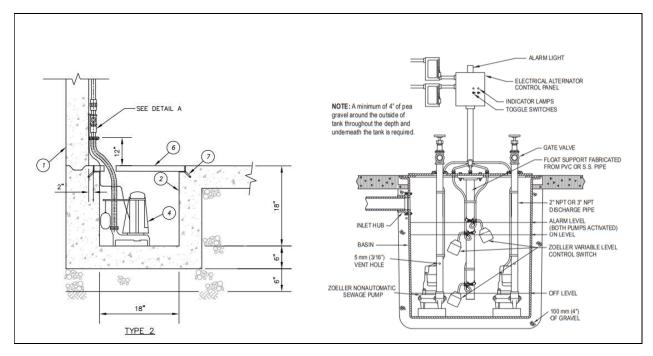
Duplex Sump Pump System with Typical Installation – (left IRWD installation detail 2021, Construction Manual, STD. DWG. G-6, right Zoeller duplex sump pump assembly)
